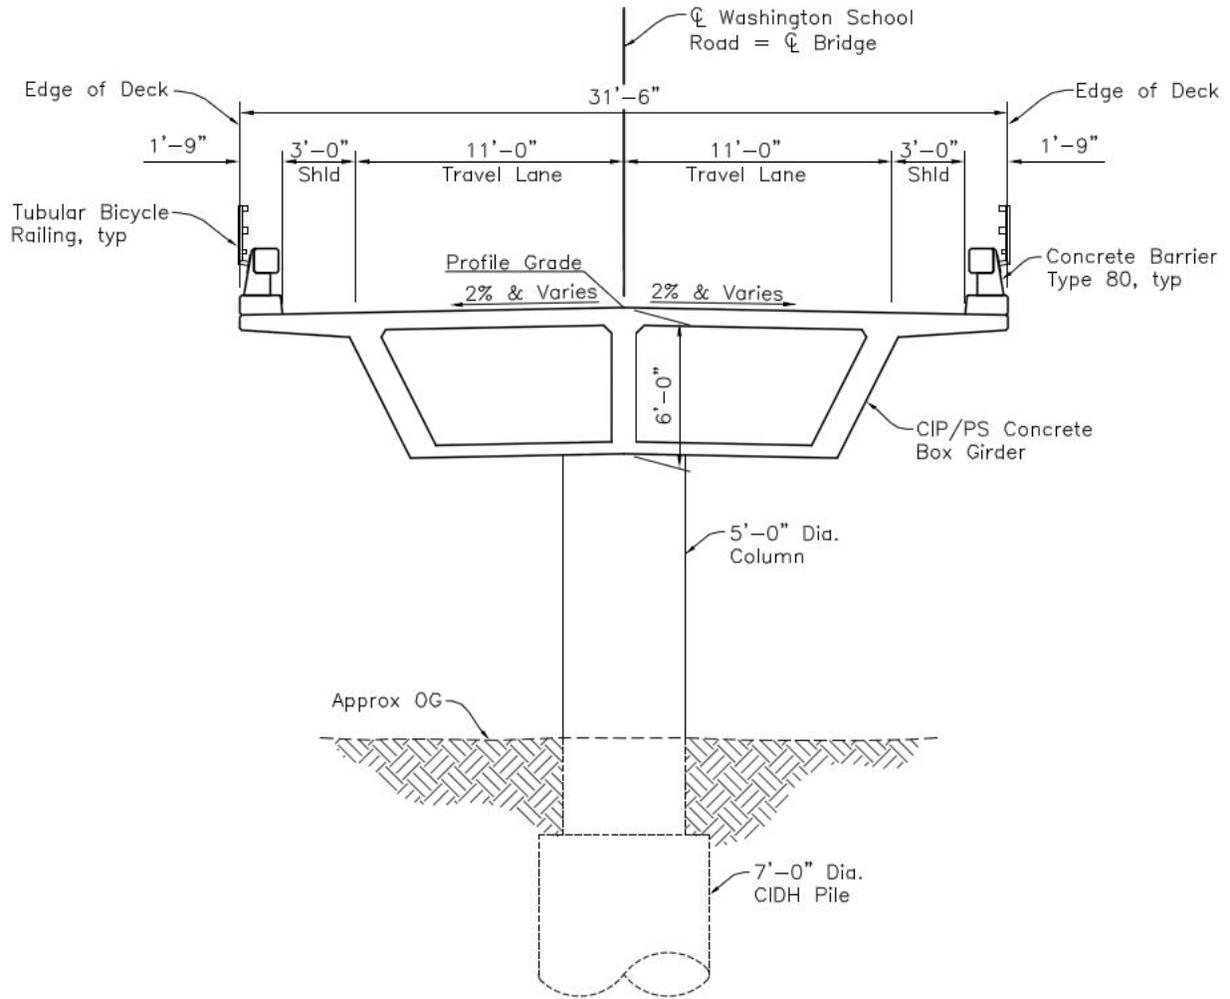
Two Lane CIP/PS Concrete Box Girder Typical Section
